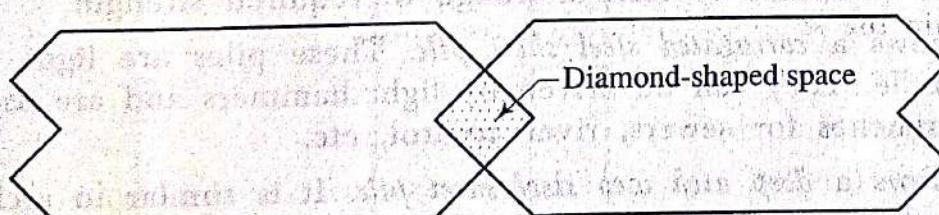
shows the tongue and groove type of pile. After the piles are driven, the cement grout may be forced in the spaces between the piles. Fig. 7-42 shows the Vee-jointed pile. The cement grout may be forced through the joints to make them watertight. Fig. 7-43 shows the piles which when placed side by side form a diamond-shaped space. This space is filled by the cement grout under pressure after the piles are driven. Fig. 7-44 shows the piles with semi-circular grooves at their ends. The circular holes are therefore formed when such piles are placed side by side. These holes provide space for inserting water jets, if necessary. The cement grout under pressure is forced through the holes after the piles are driven.
